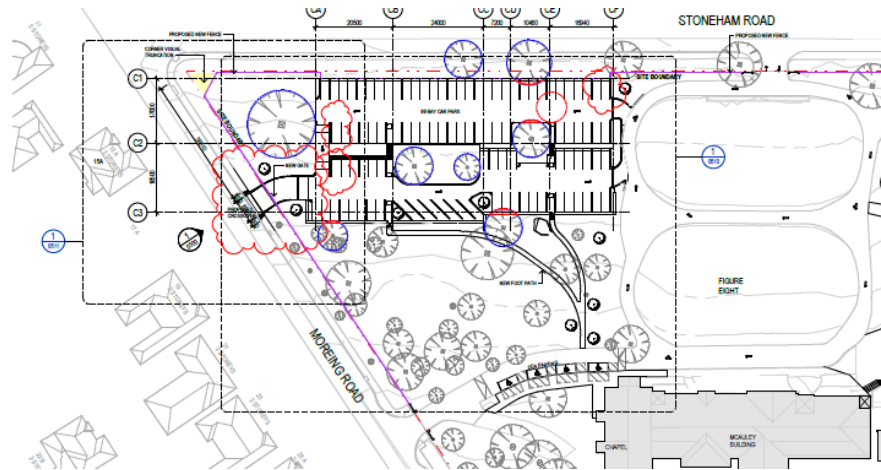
Proposed Site Plan showing location of car park with additional crossover off Moreing Road
